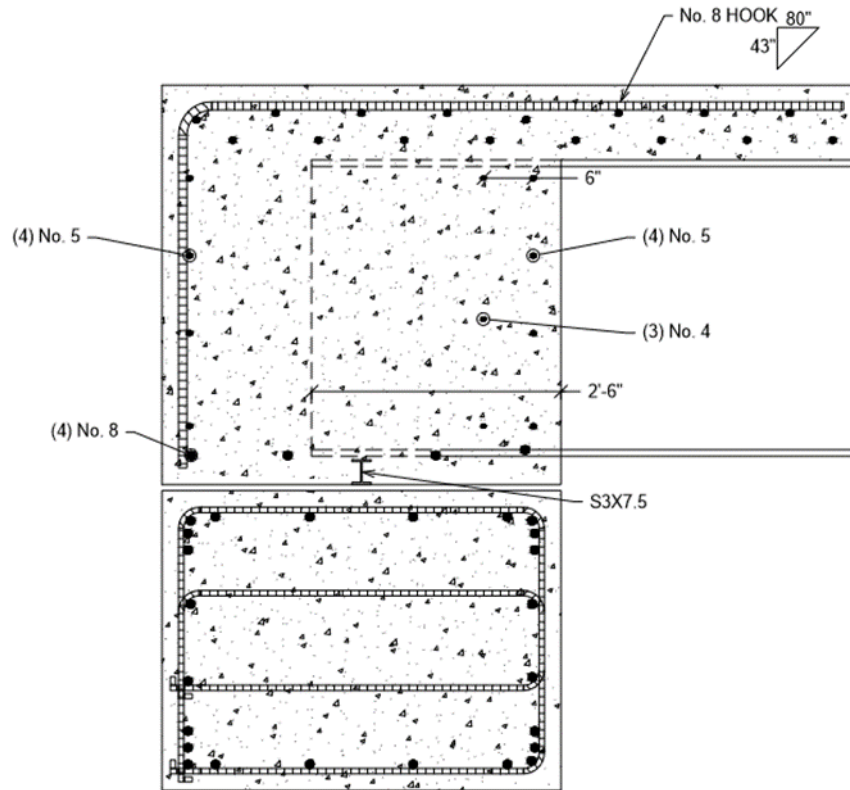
Grouted reinforcing bar coupler section through beam.
